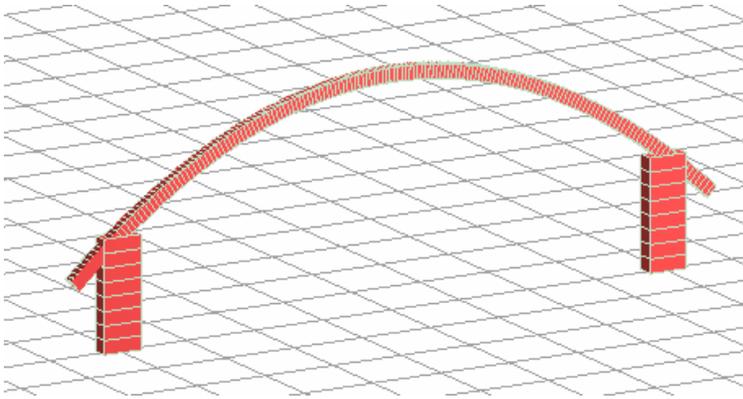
The extended arch used to derive the k-factor for the new Fulton Road Bridge shown superimposed on the piers of the actual structure
